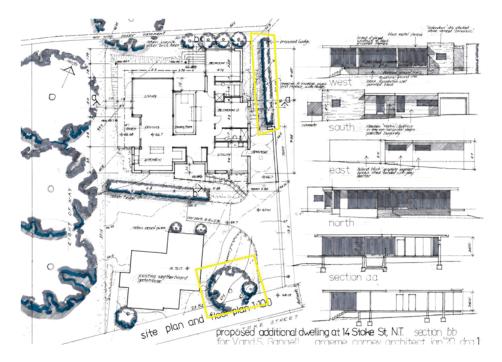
the architect plans identifying the locations of the trees. Plan courtesy of Graeme Corney Architect.
